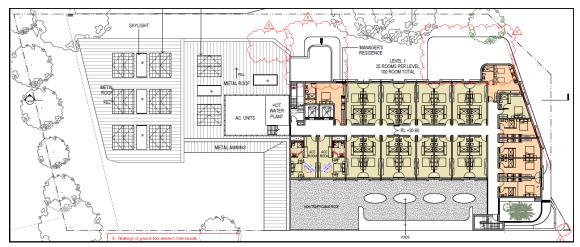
Previous hotel level 1 and warehouse roof plan (DA-101, Issue E)
